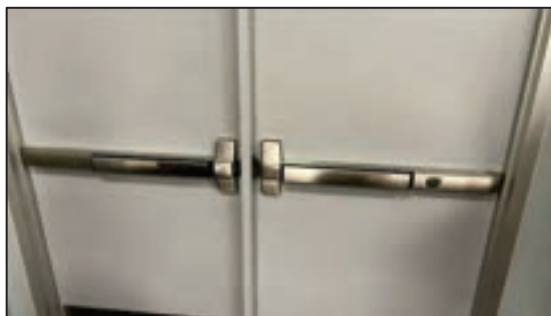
Electrified panic bar with dogging – CAK Building (RCC)
